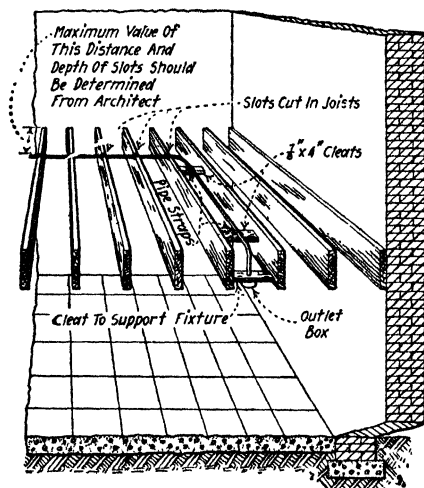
Showing methods of supporting rigid conduit in slots in joists and on cleats between joists.
